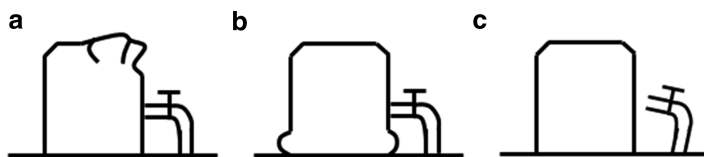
Schematic view of some of the most common failure modes of storage tanks: (a) roof damage due to sloshing, (b) elephant's foot buckling and (c) disconnection of inlet/outlet piping
